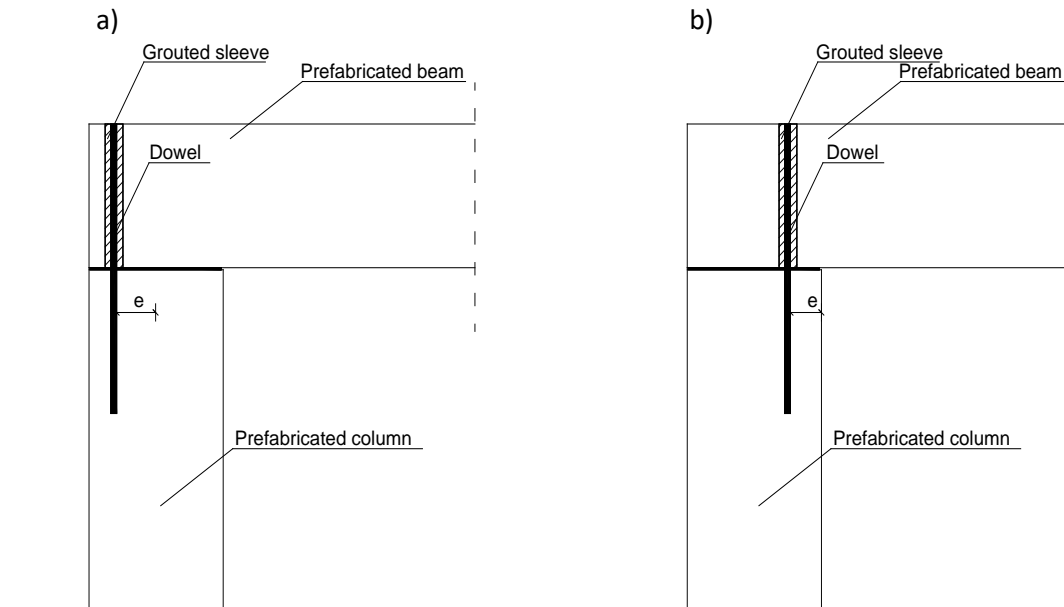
Example of beam-to-column dry connection with eccentric position of dowel
